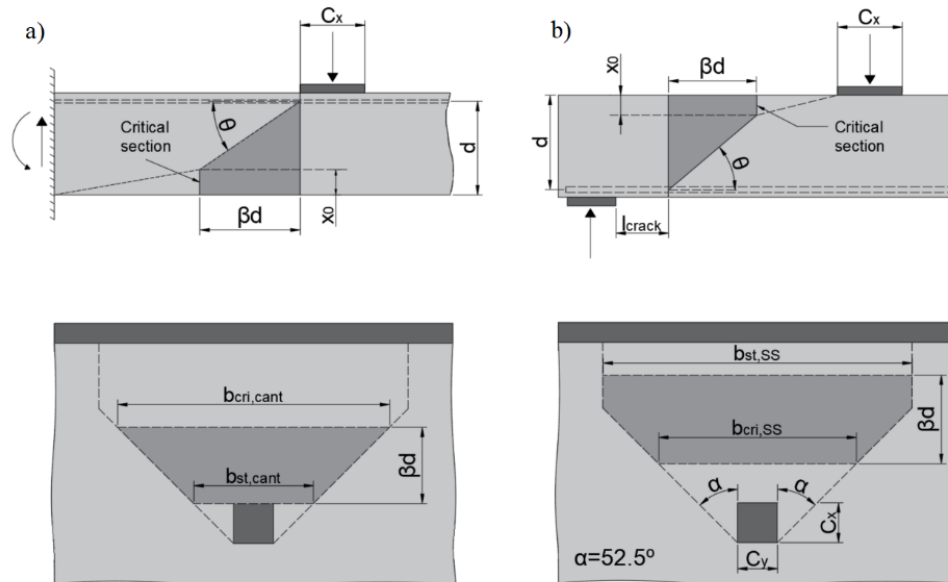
Position of the critical section: a) cantilever slab; b) simply supported slab.
